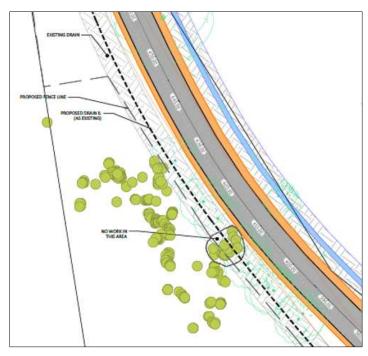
Screenshot of relevant engineering plan showing locations of threatened flora to be avoided during road upgrades, and proposed fencing to protect the population. See Appendix F1 for full plan (Shire of Murray 2021)
